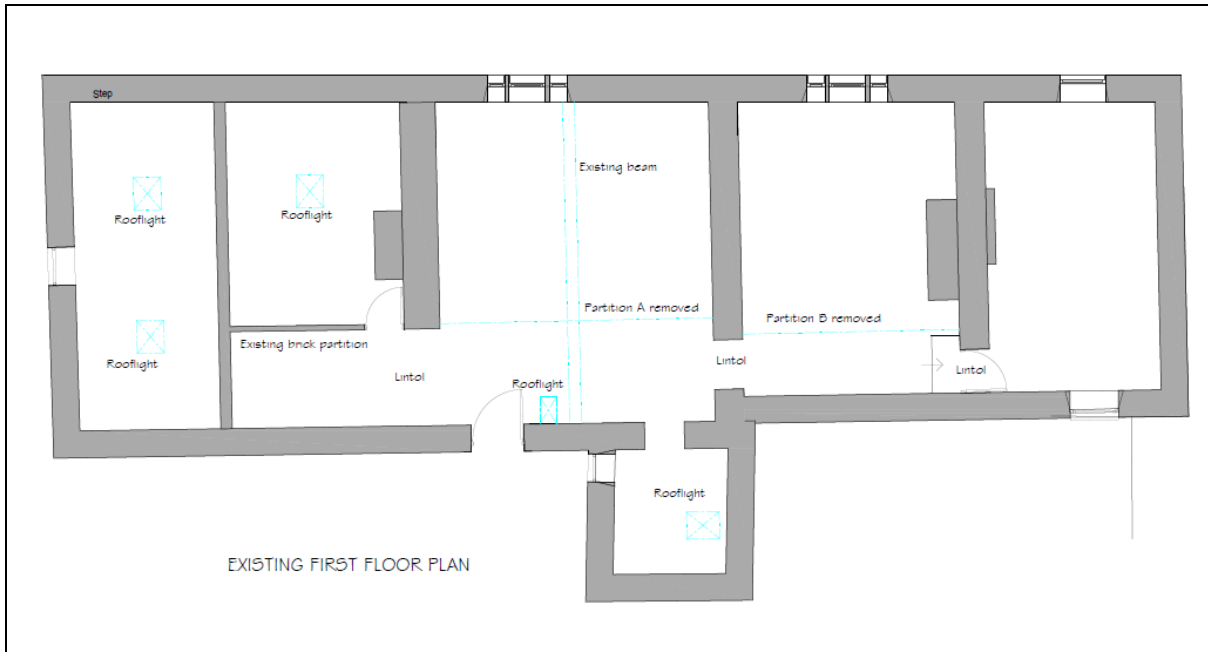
Existing 1<sup>st</sup> Floor Layout
